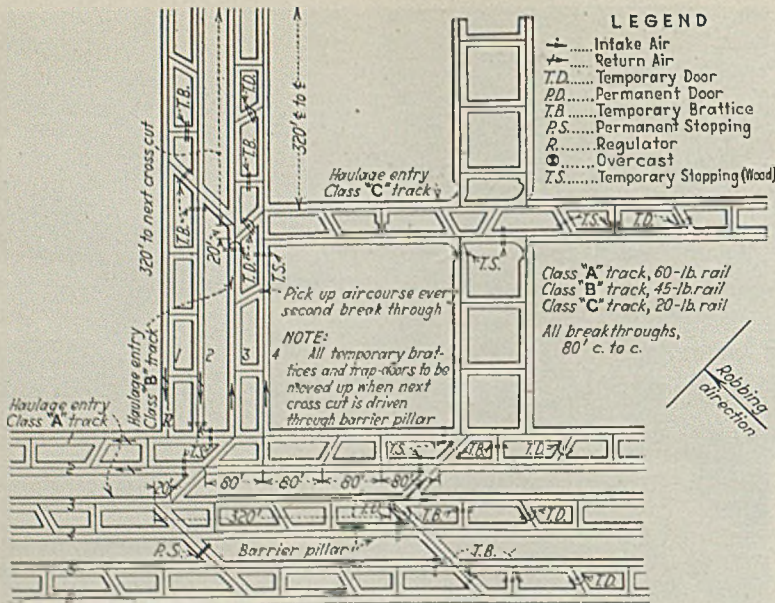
Standard Entry-Driving and Temporary Ventilation Plan
